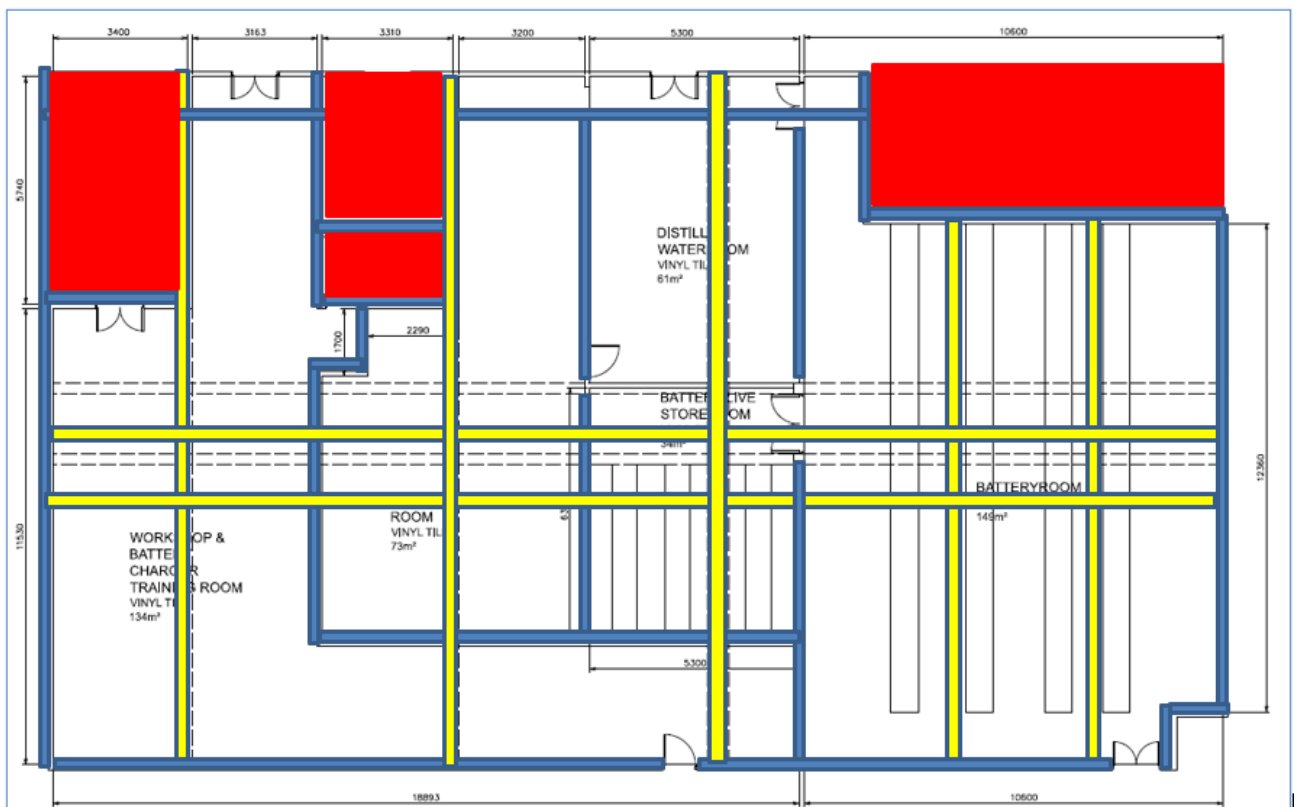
DC Workshop, Battery Room, and other rooms – beams & walls forming pockets
